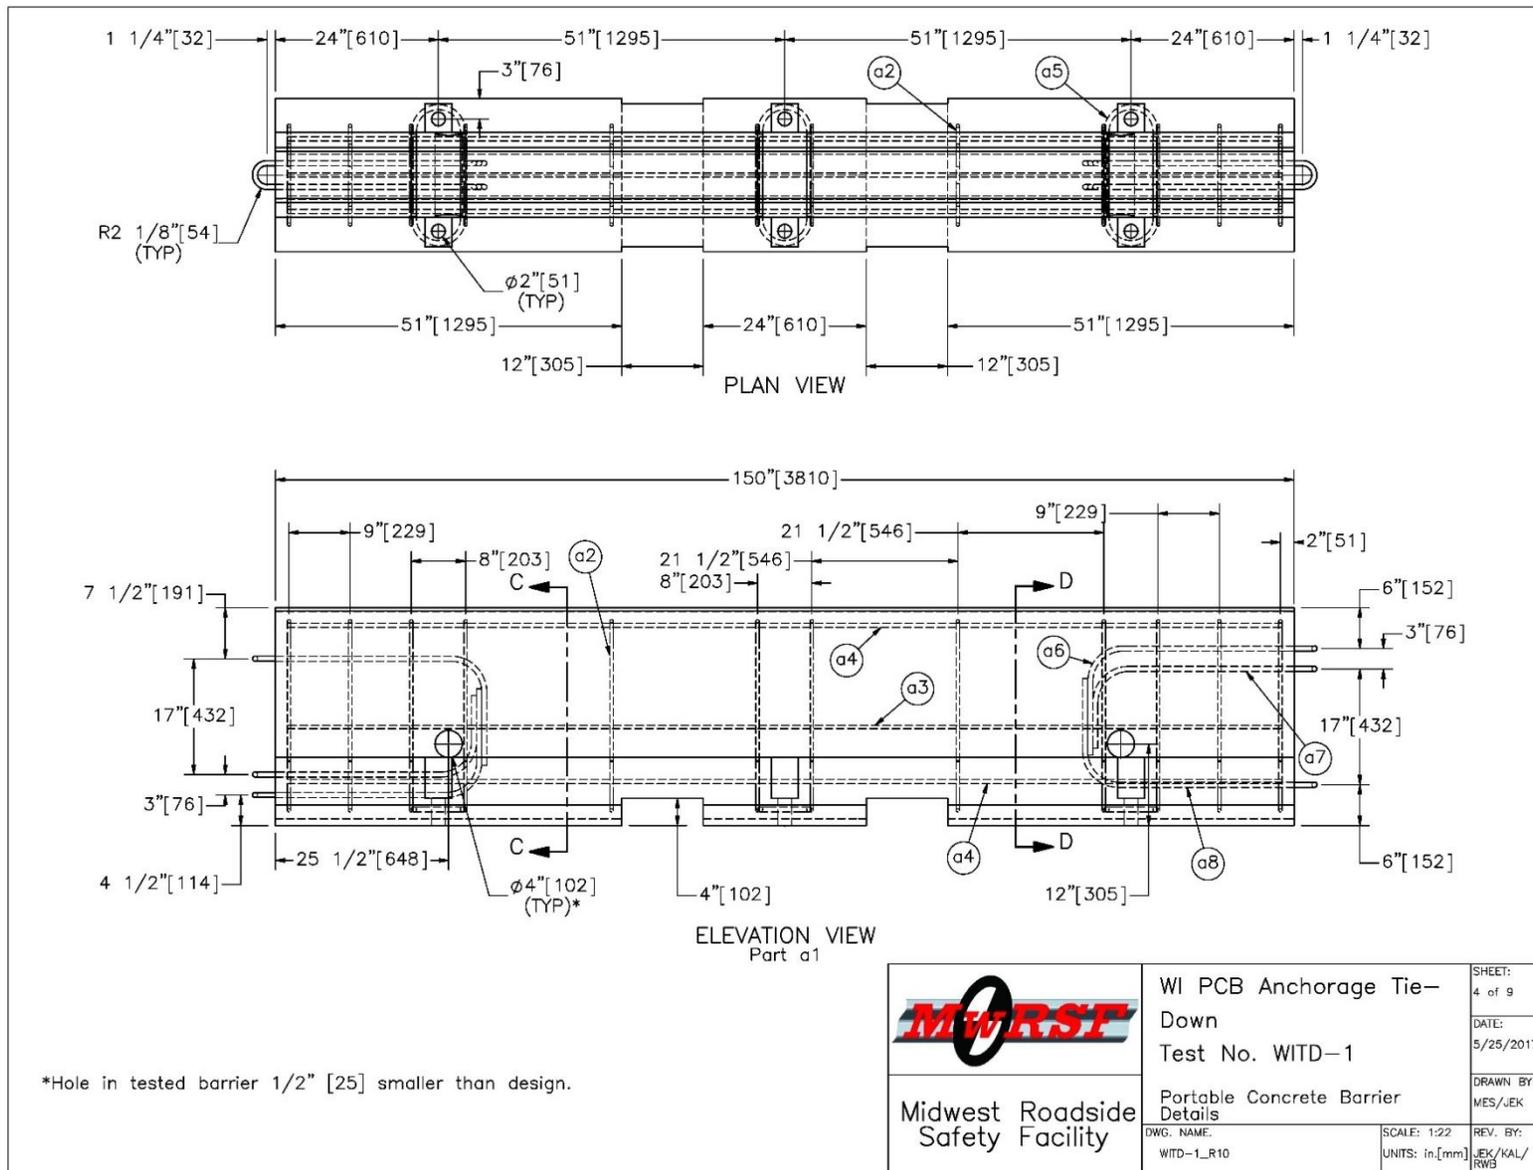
Portable Concrete Barrier Details, Test No. WITD-1
